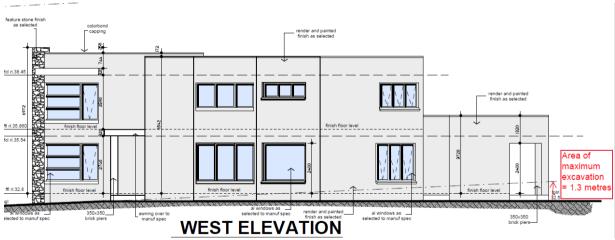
Western Elevation depicting where maximum extent of excavation is located
